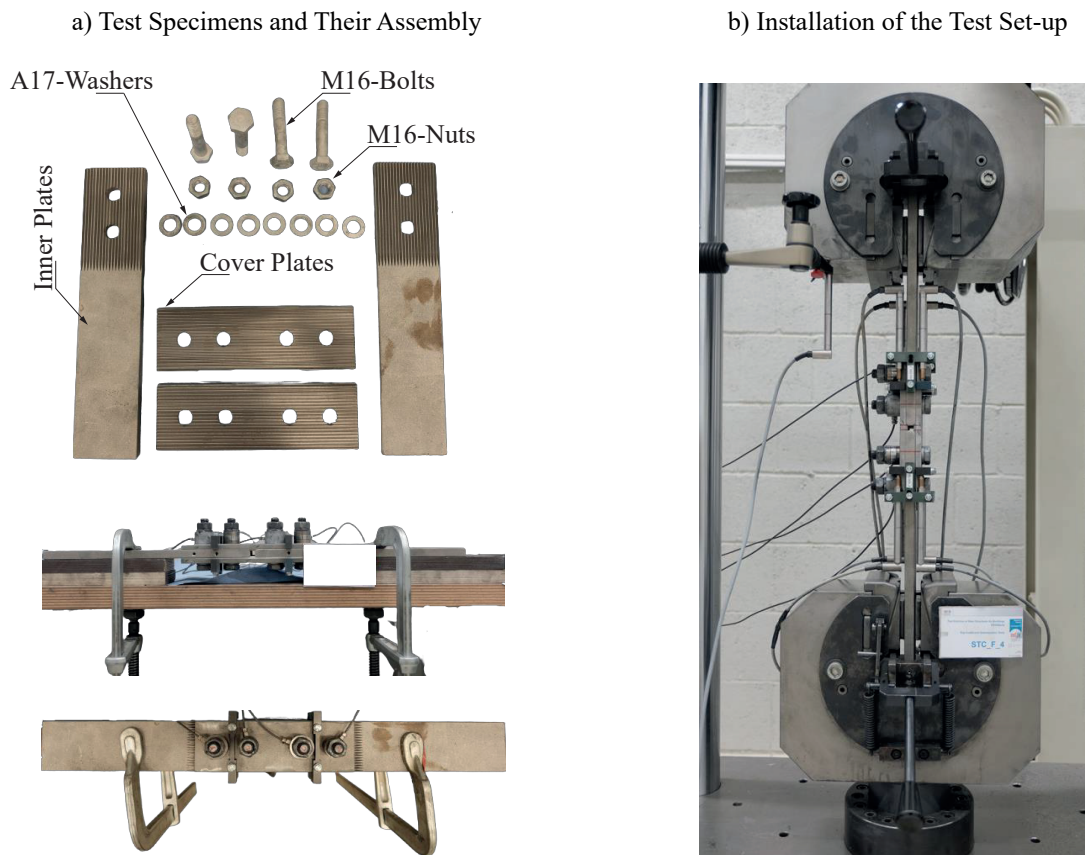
Assembly of the test specimens and installation of the test set-up [4].
